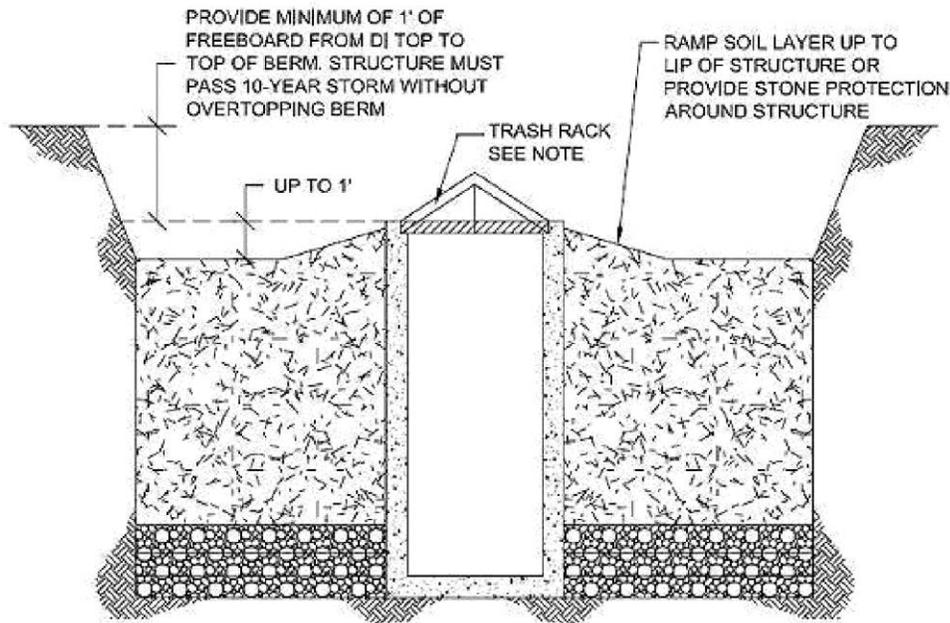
Typical Detail of how to prevent bypass or short-circuiting around the overflow structure (source: VADCR, 2010)
